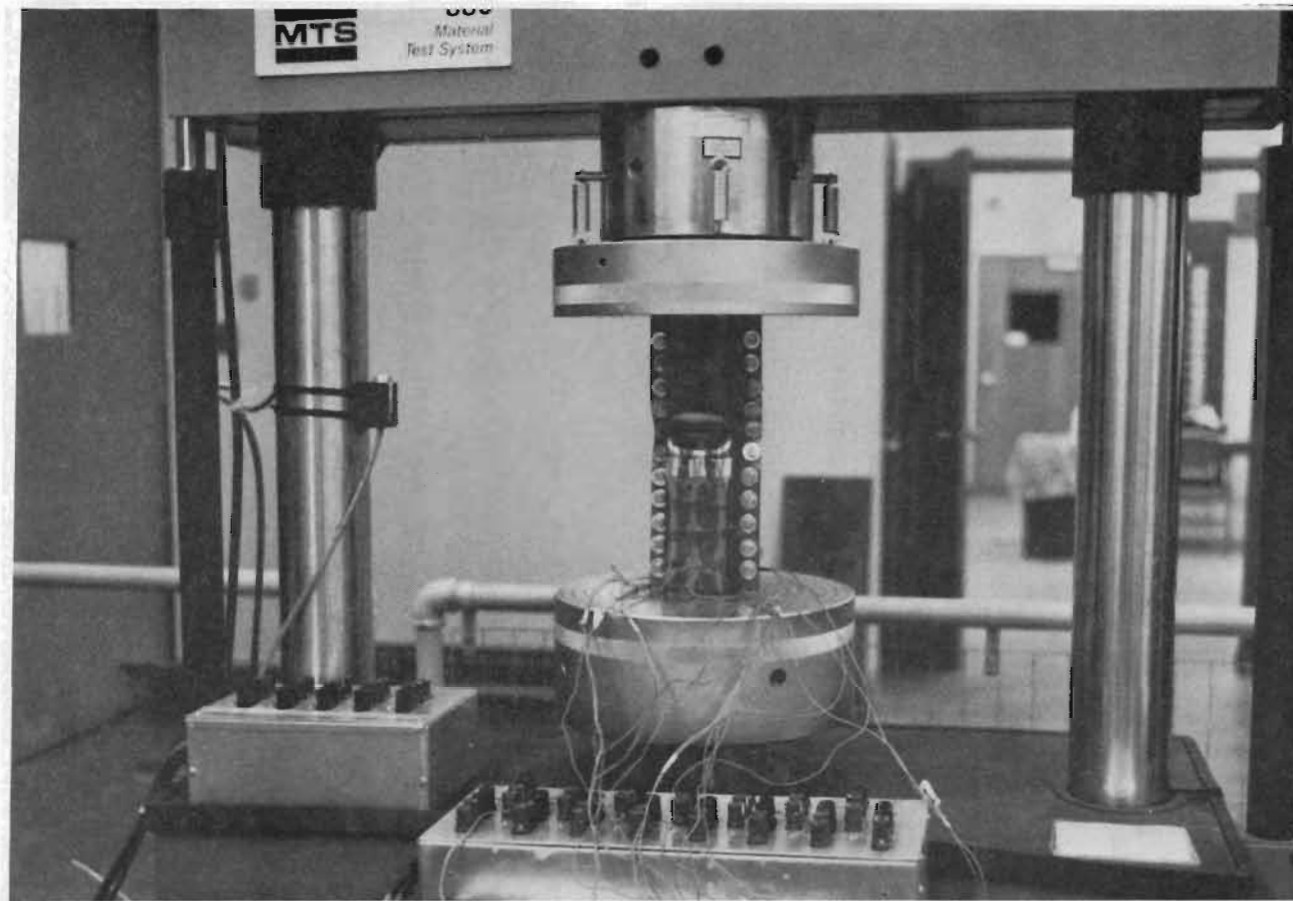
Failure of Stub Columns with Stiffened Flanges (Front View)
